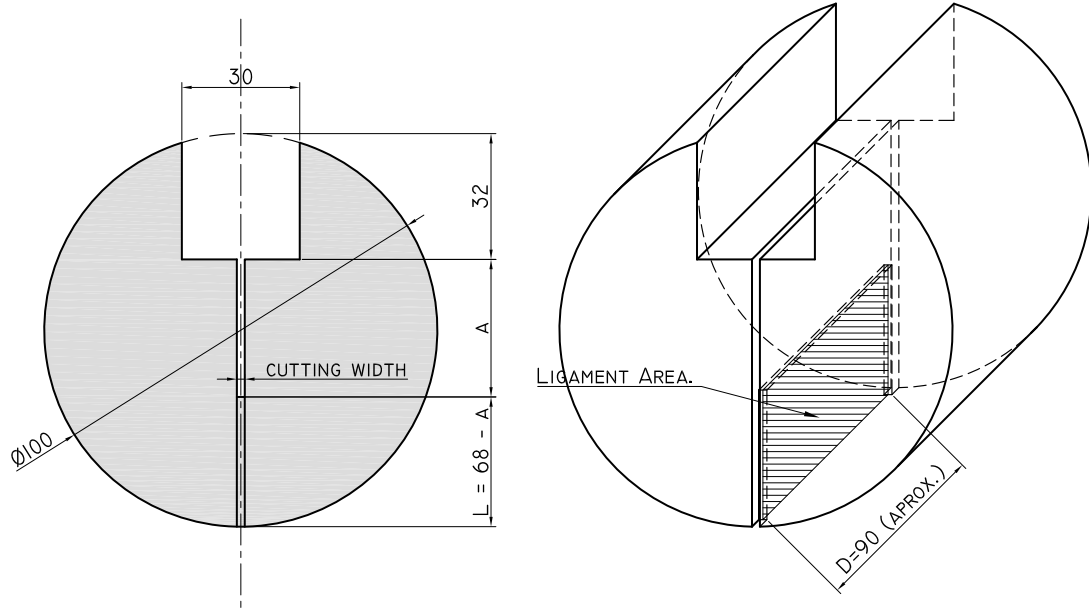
Dimensions of the WST specimen. Taken from Ref. [5].
